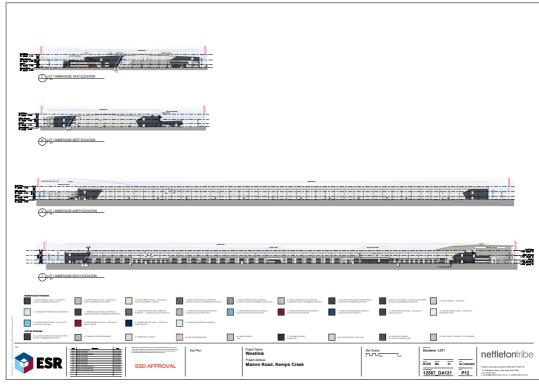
Elevations Lot 1 - (Source: Nettletontribe)
